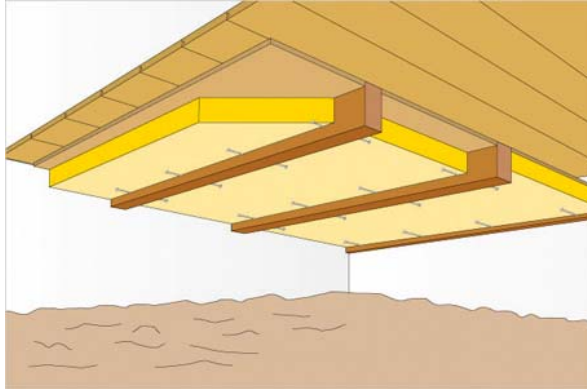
, schematic representation of a wooden floor construction (Isover, 2011)
